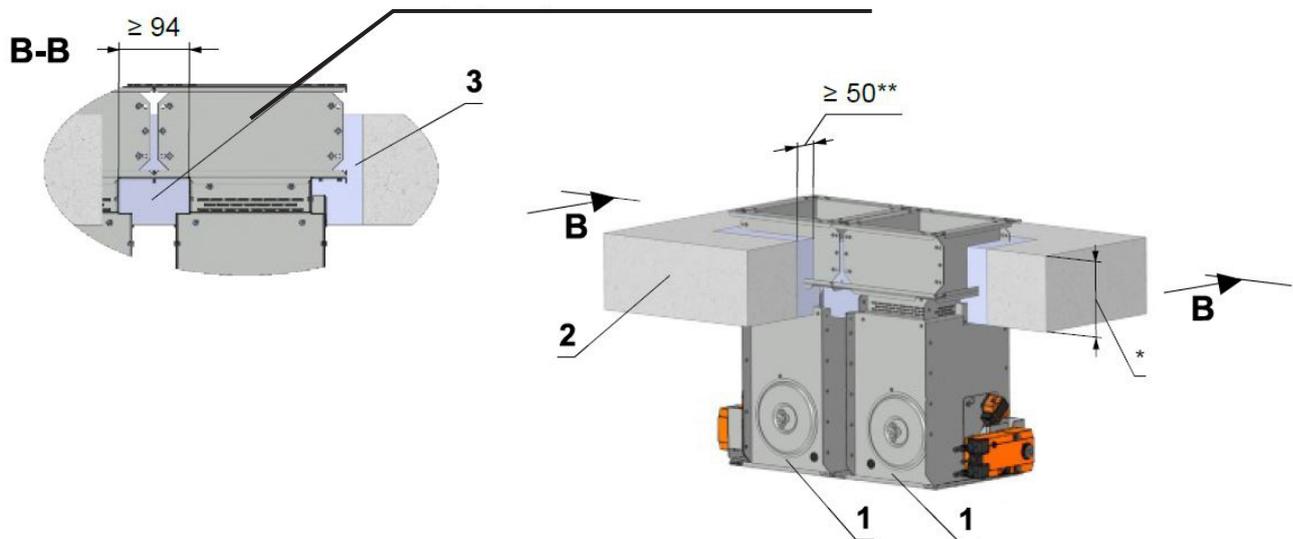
Solid ceiling construction- battery- mortar or gypsum
